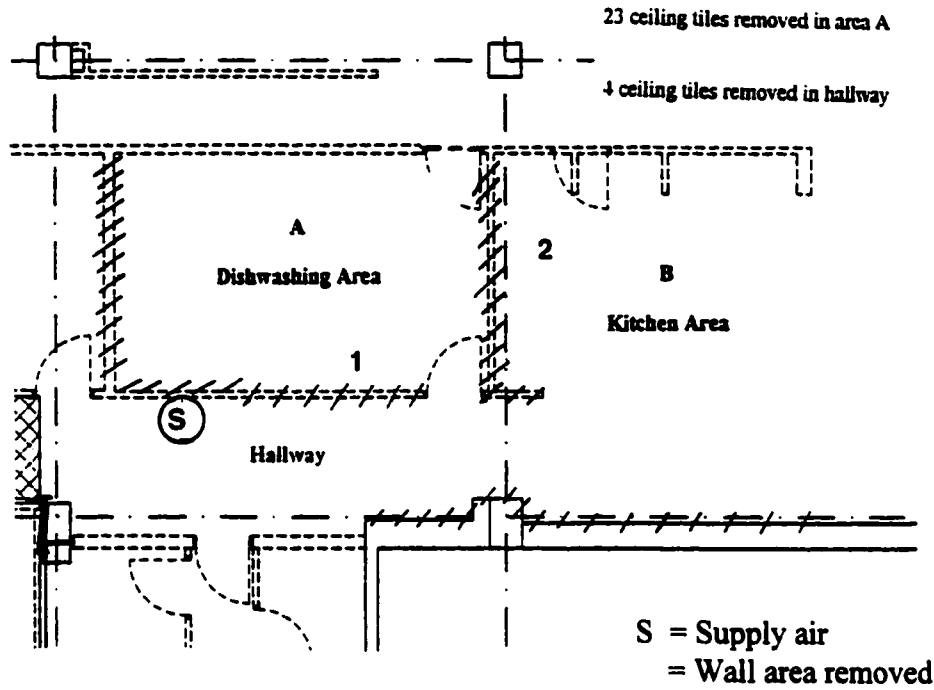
Floorplan of Removal of Water Damaged Drywall Activity Test Site No. 1
